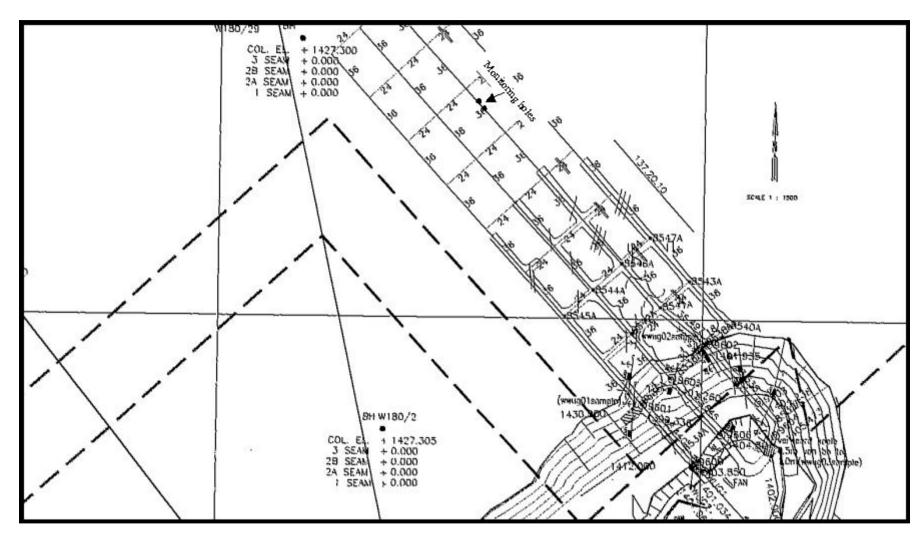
Section plan Colliery 'F' Site 1 (not scaled)
